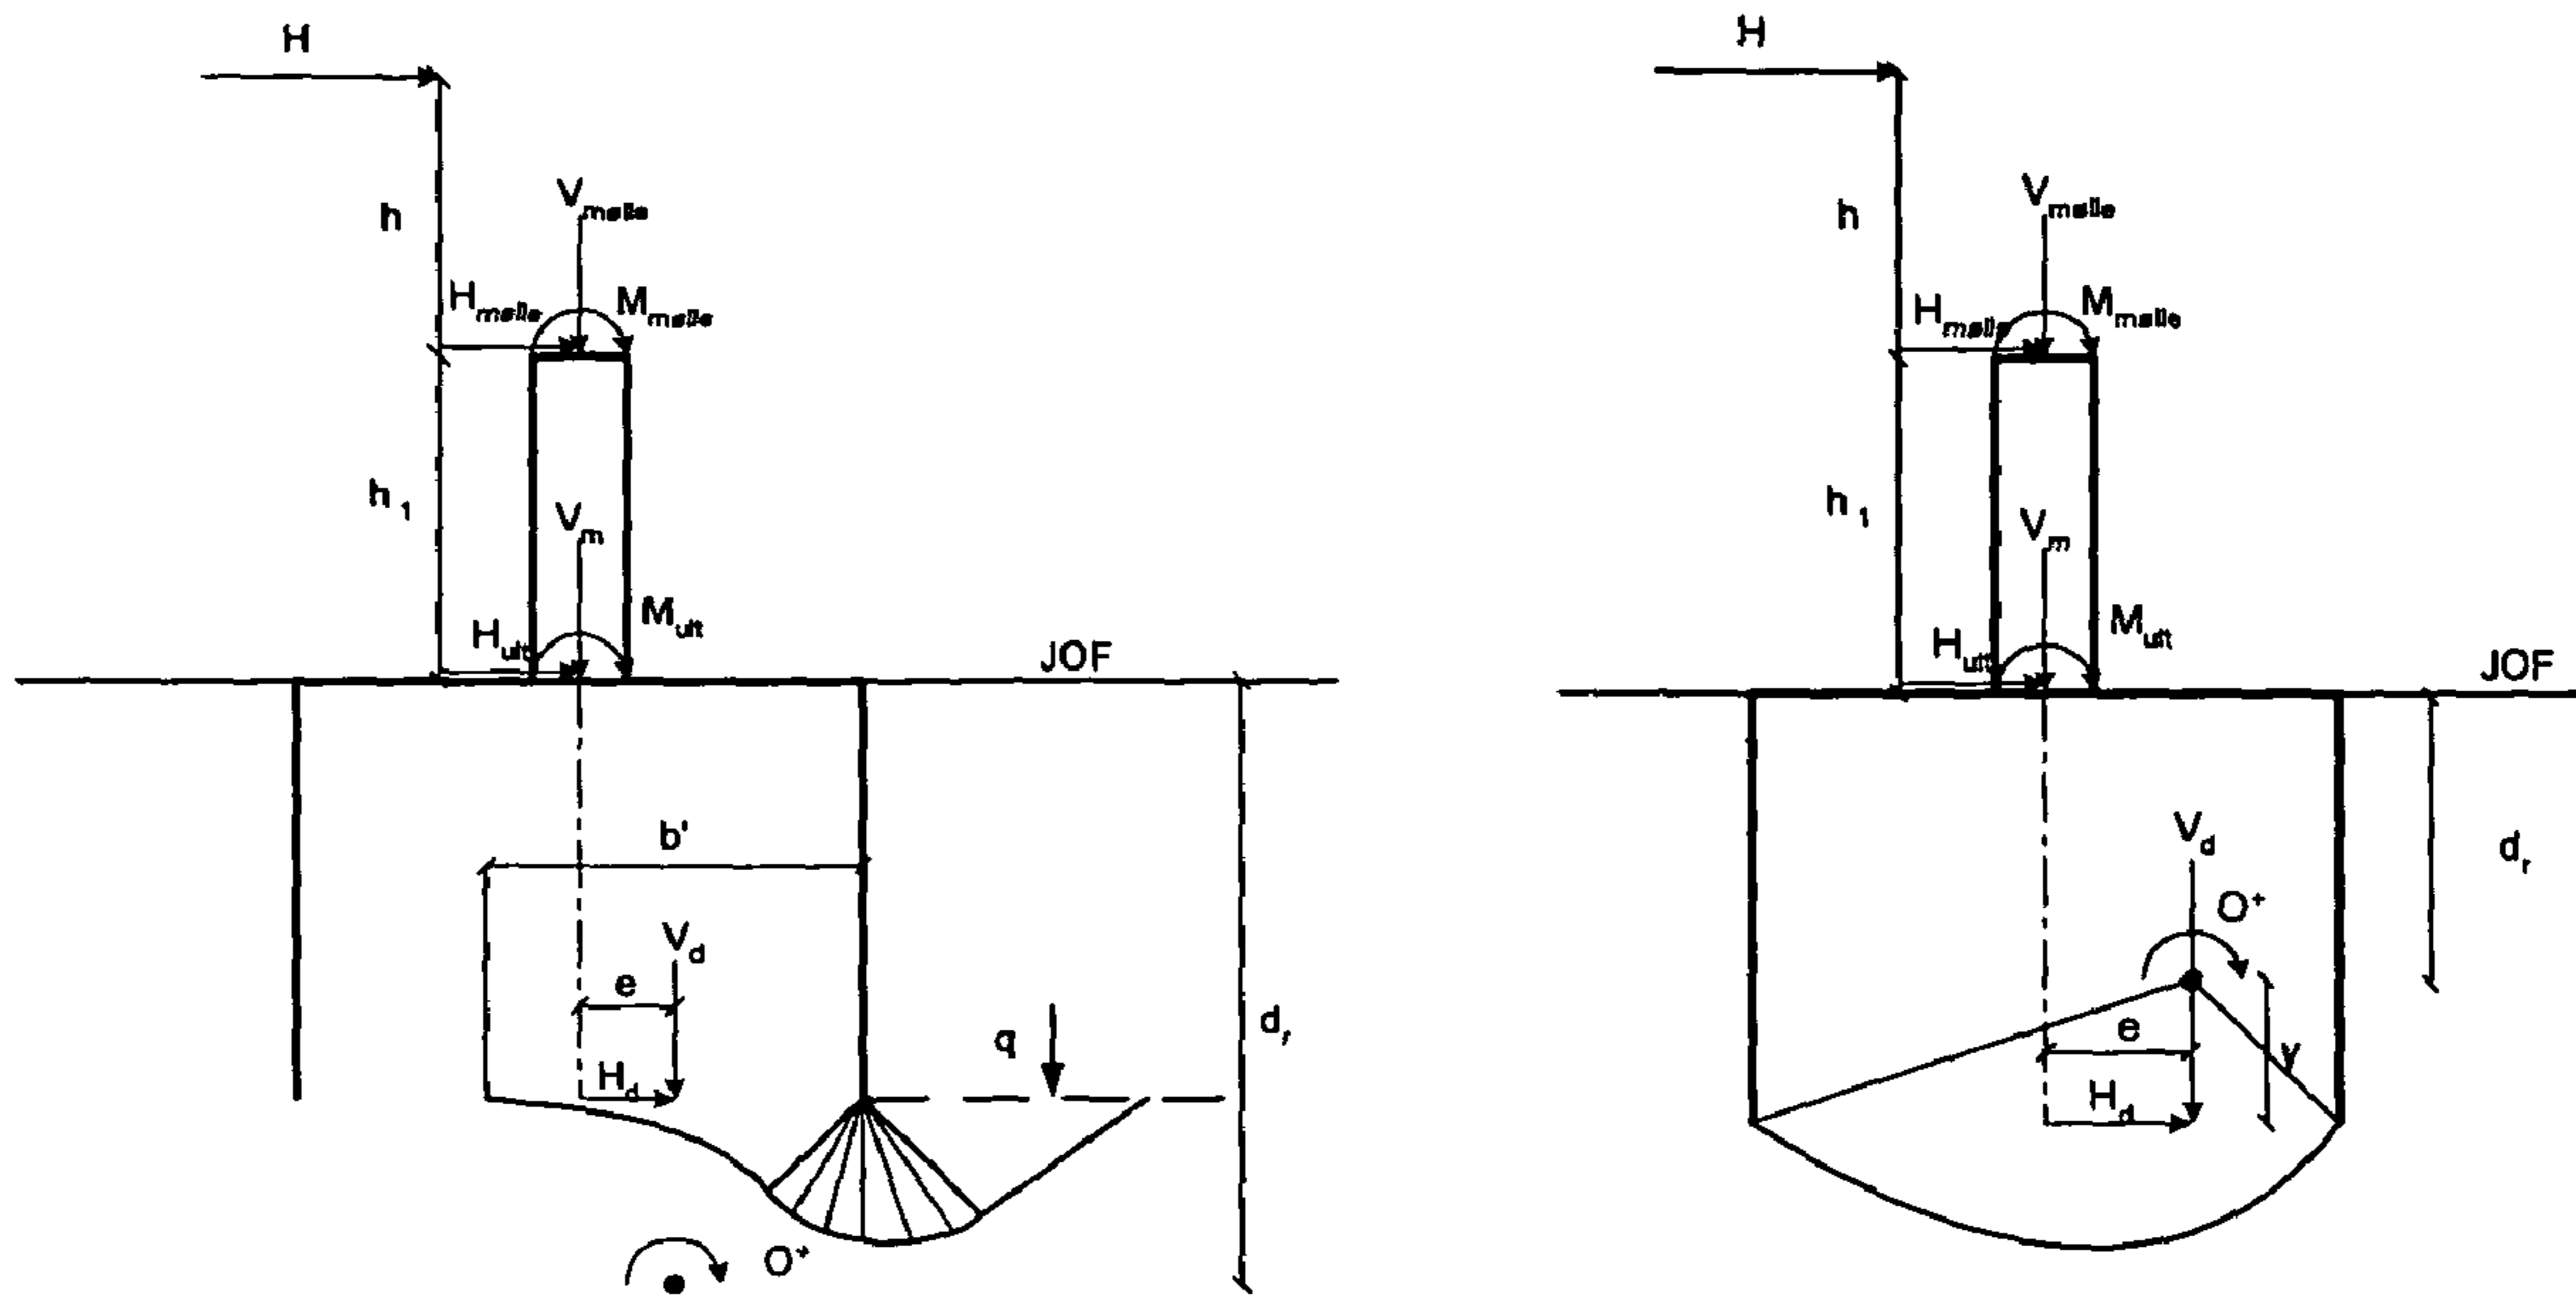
Failure mode a) Bearing capacity failure. b) Line rupture
